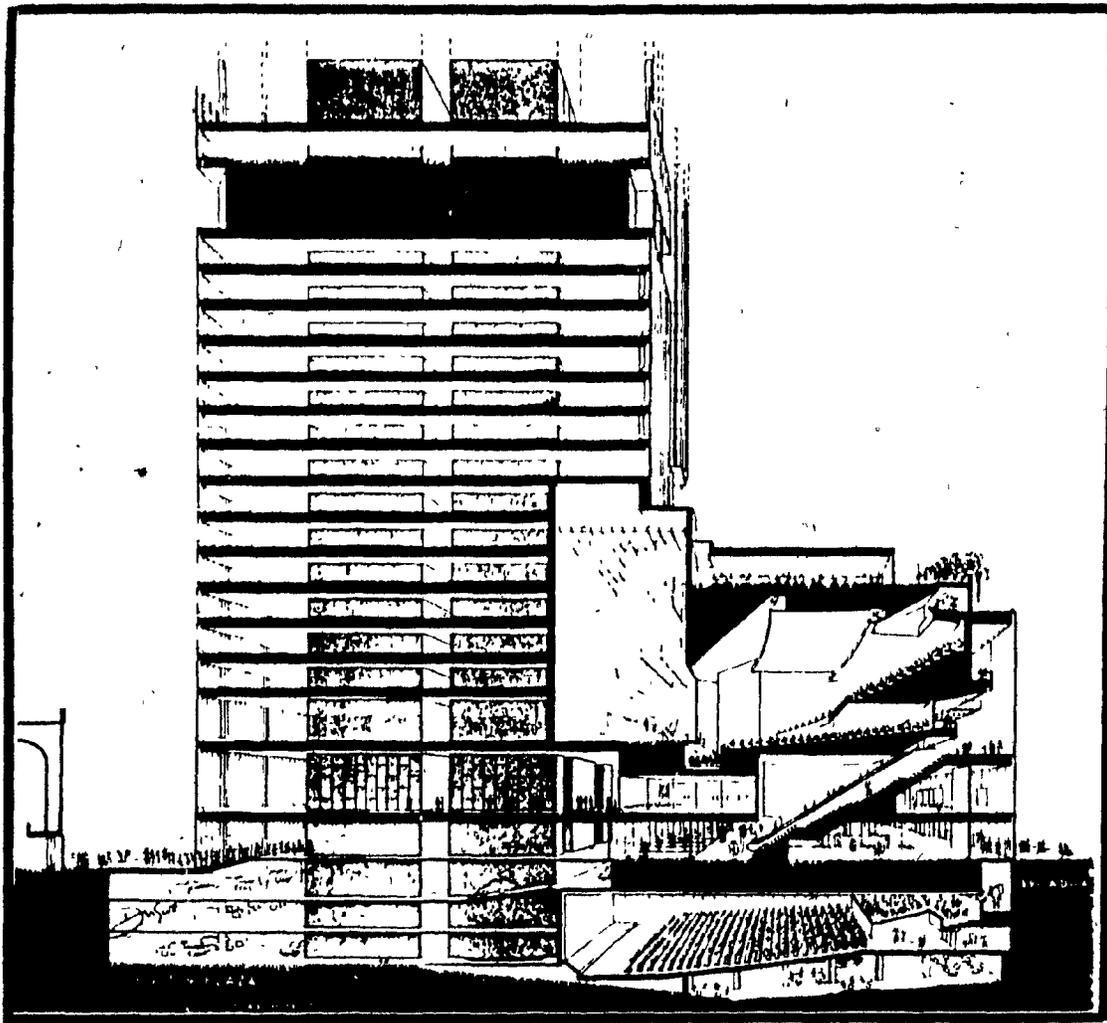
Section through the lower floors of W.T. Grant building. The ground floor Broadway frontage has retail shops, banks and office lobby are on the second floor.
